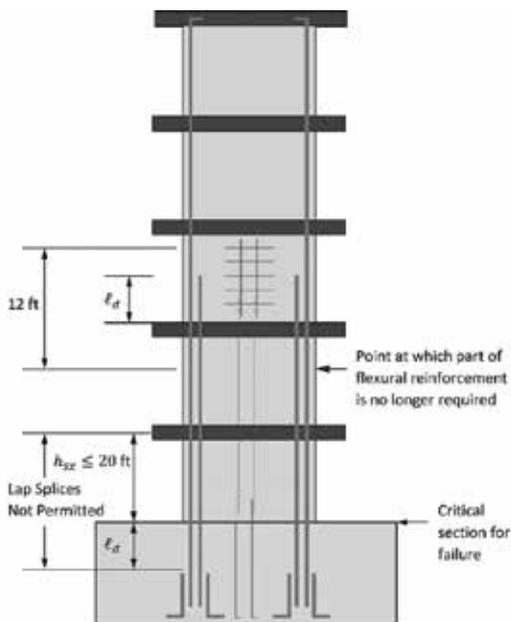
Termination of wall flexural reinforcement and lap-splicing limitations at critical section
